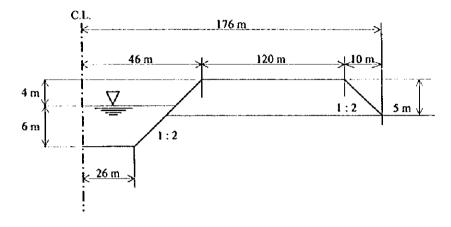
Standard Cross Section of Nadi Diversion Channel (1,000 m from Outlet)
